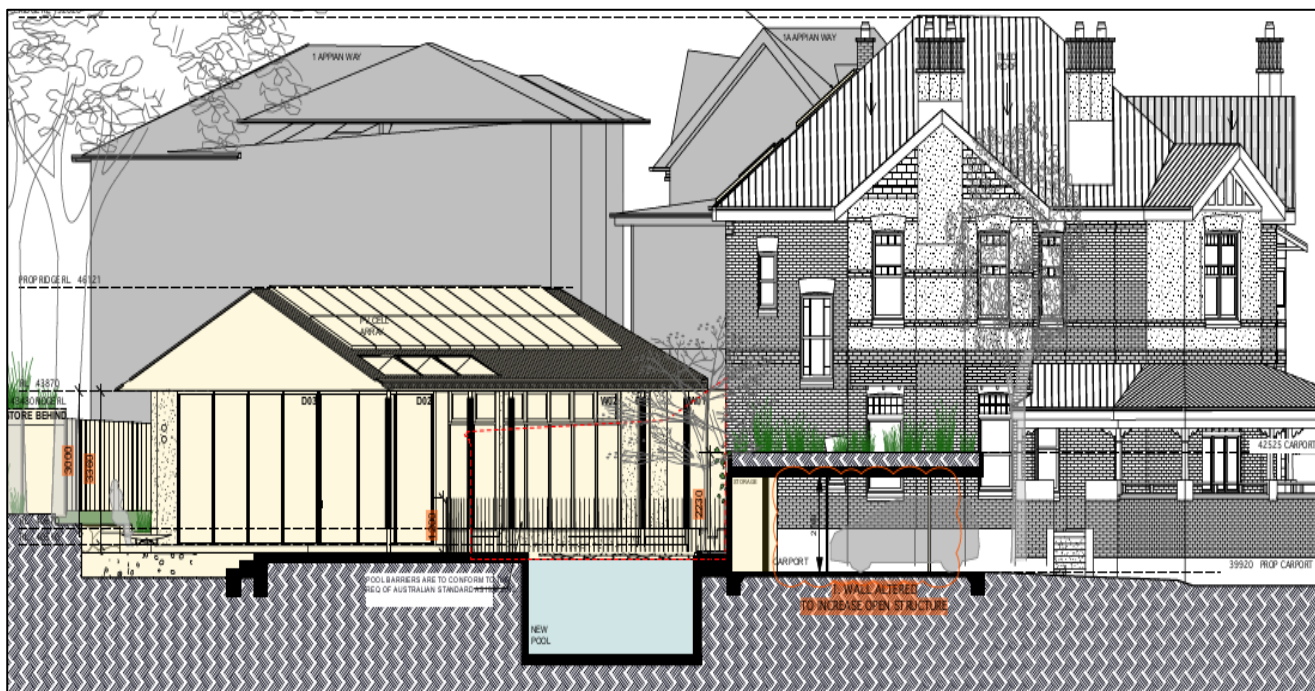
Extract of the applicant's submitted amended North Elevation. Source: (Some Commonplace)
